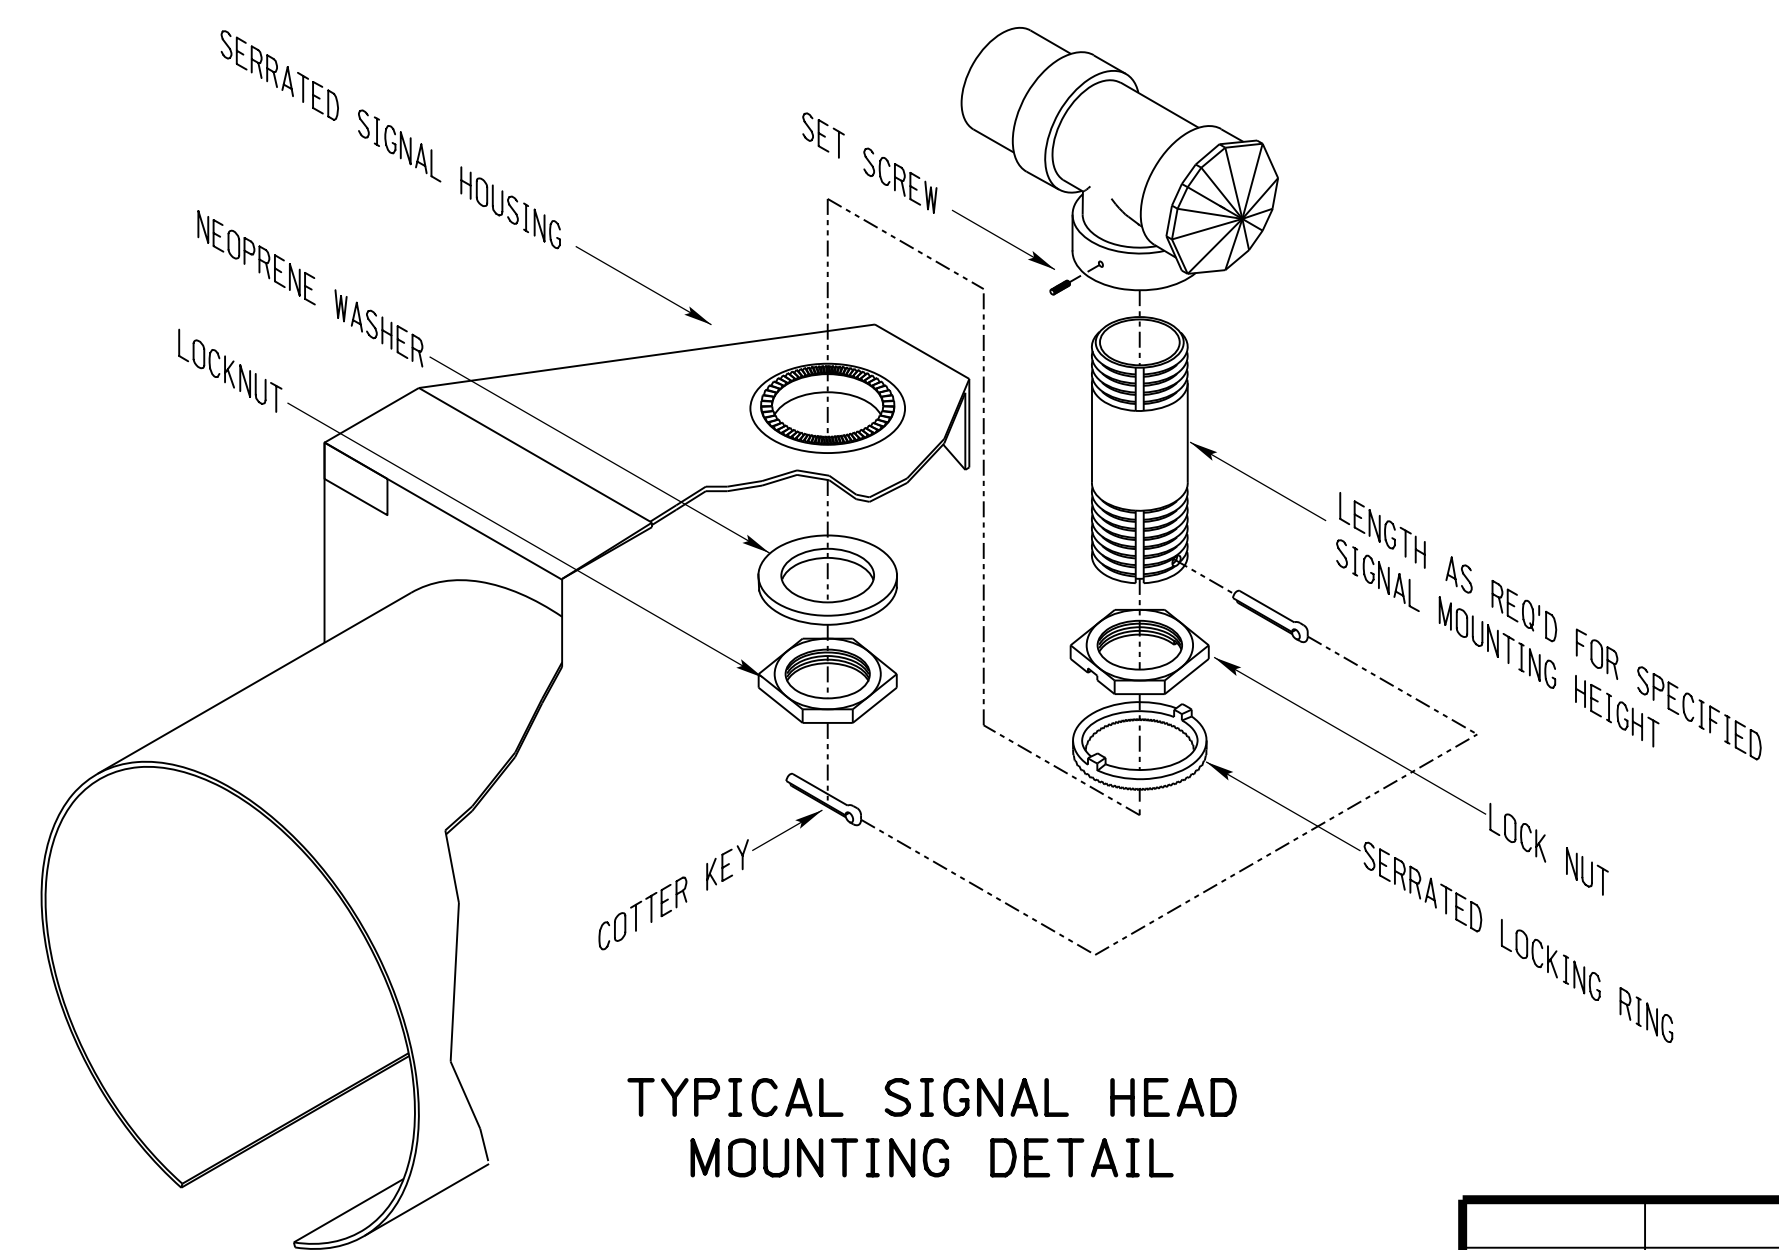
DETAIL IS TYPICAL FOR 1-WAY AND 2-WAY SIGNAL HEADS
